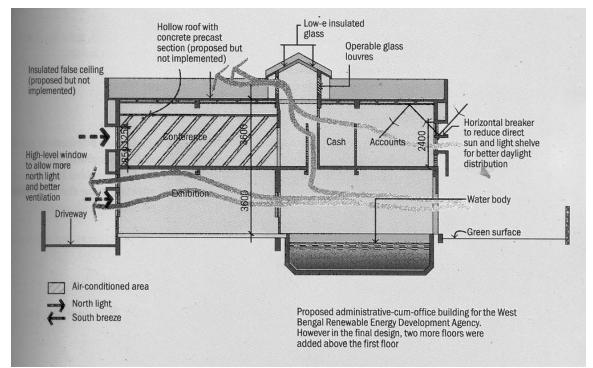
WEBREDA Building, Section for initial design scheme, two floors added later
